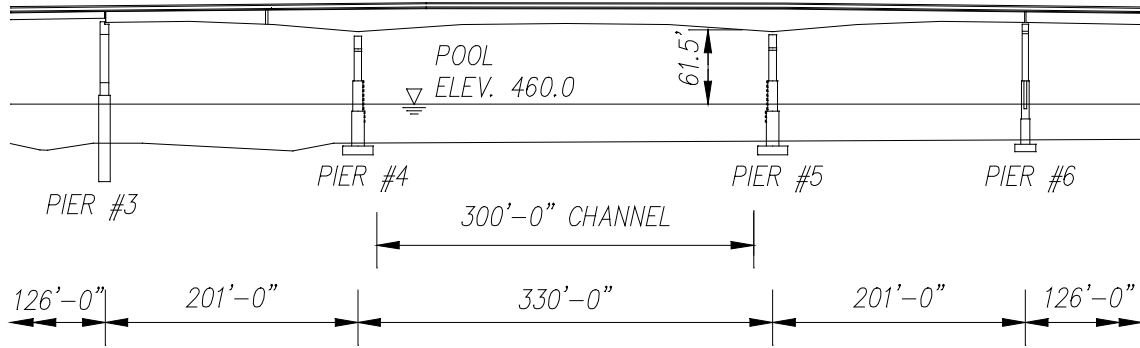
Elevation View of the Navigation Channel of the Bridge
